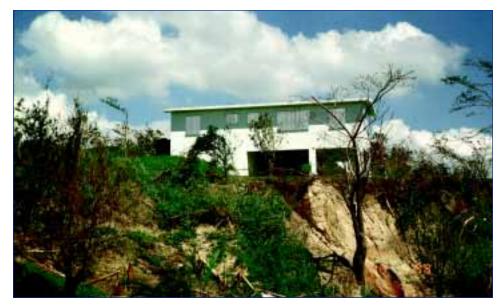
Residential home constructed of reinforced concrete and masonry with a reinforced concrete roof deck in the mountains outside Adjuntas.
